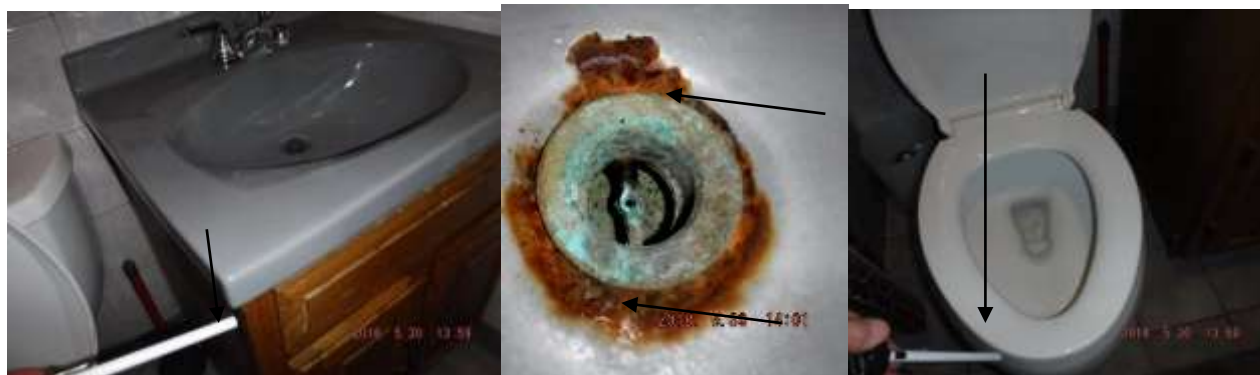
Vanity top was not secured down, toilet was loose and tub/drains was corroded and holes. There were water stains visible in several areas in the crawl space and leaking plumbing; see plumbing section comments.
